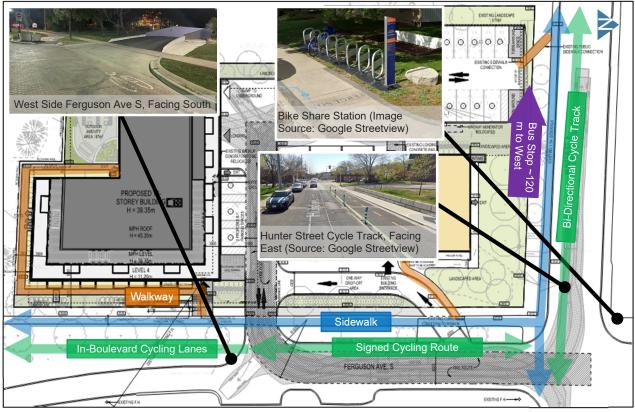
TDM Site Plan Summary (Using November 27, 2023 BDP Architectural Plan as Base Image)
